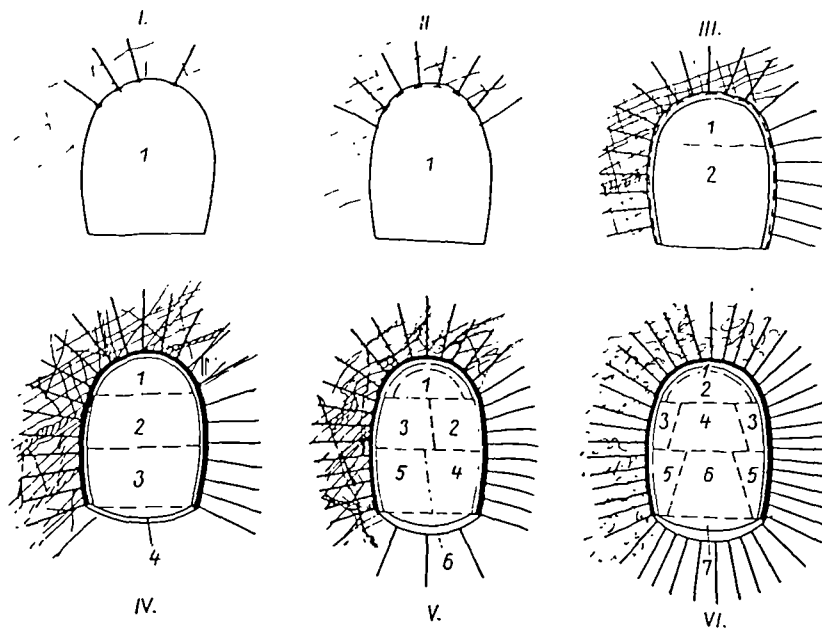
New Austrian tunnelling scheme - Six classes of tunnel excavation scheme, with corresponding support construction sequences (from Hobst & Zajíc (1983))
